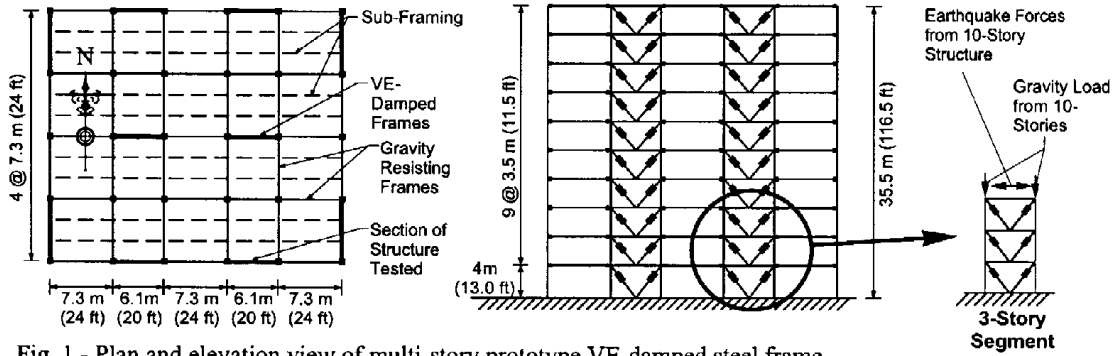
Plan and elevation view of multi-story prototype VE-damped steel frame.
